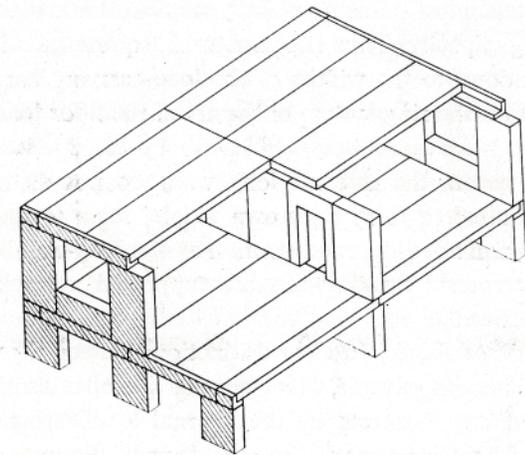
Diagrammatic view of a "classic" long wall construction in a prefabricated building.
